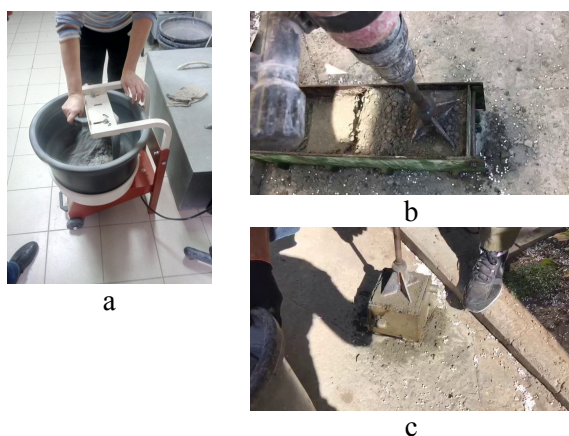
Selection of the composition of the roller-compacted cement-concrete mixture: a – mixing cement-concrete mixture in the laboratory; b – laying of the cement-concrete mixture in the form-prism; c – laying cement-concrete mixture in a cube-shape
